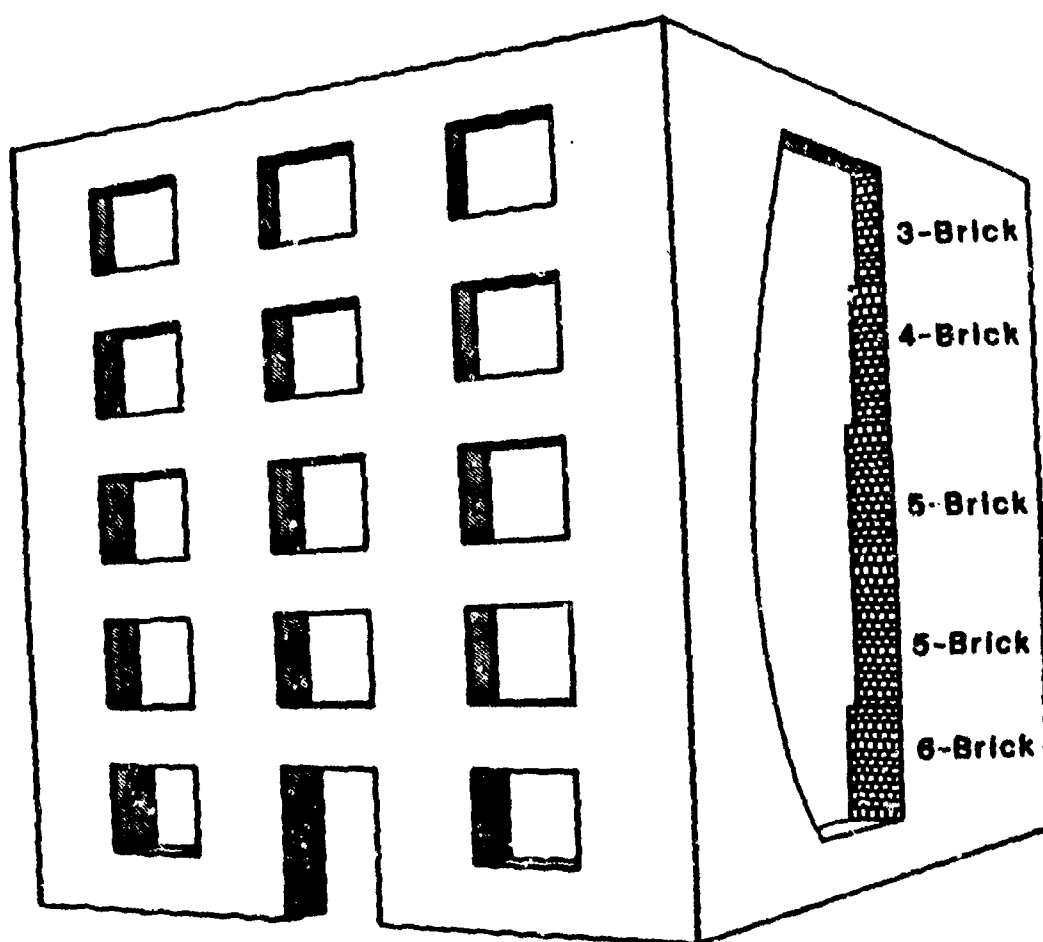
Building types: I.D. characteristics (mass construction, brick).
